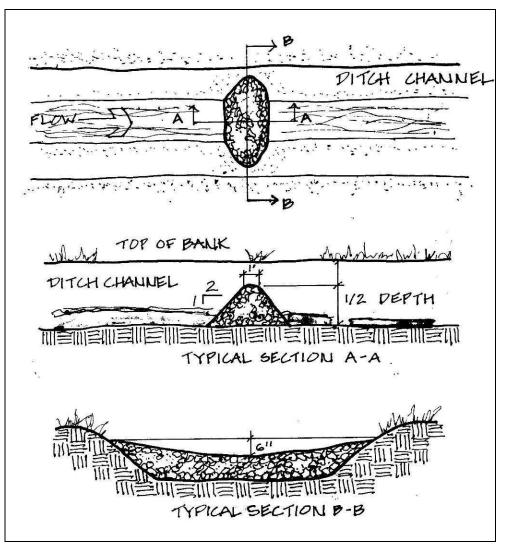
Ditch Check Dams: 3 Views - plan view, side section view, cross section view
